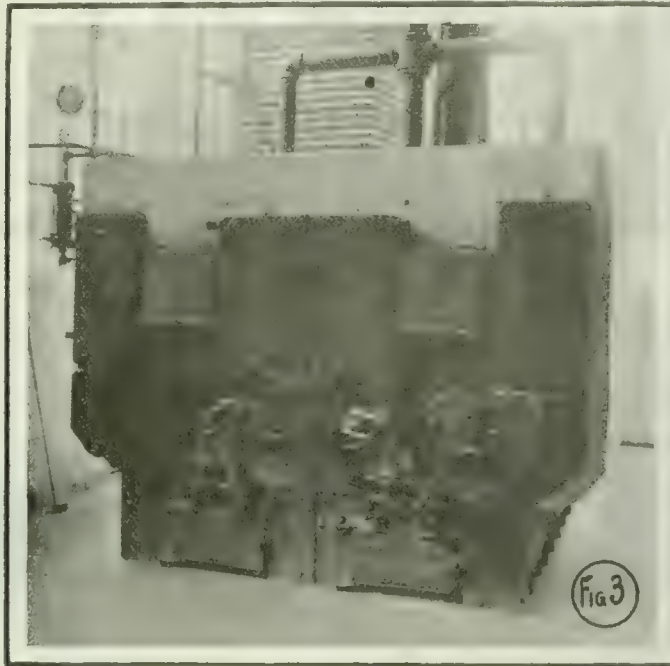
BOILER ROOM TO THE RIGHT OF THIS PICTURE, AND LOWER THAN FLOOR LEVEL, IS PLACED THE AUTOMATIC ELECTRIC WATER FEED PUMP.
